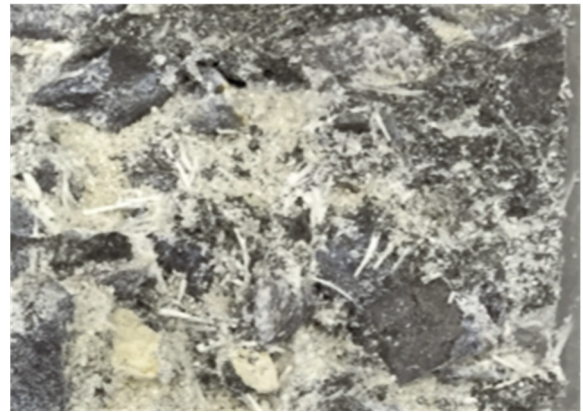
Cross section of specimen (T24N-F1.0%-2)
